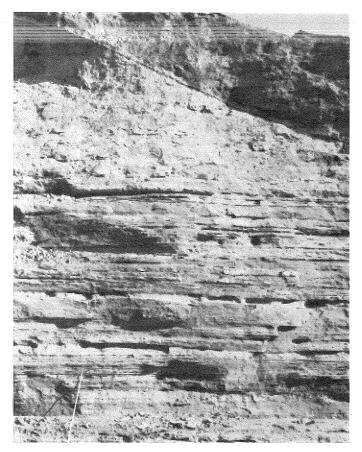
Stratification in foundation at east side of breach. Note pea-gravel drain and compacted earth lining above. December 28, 1963.
